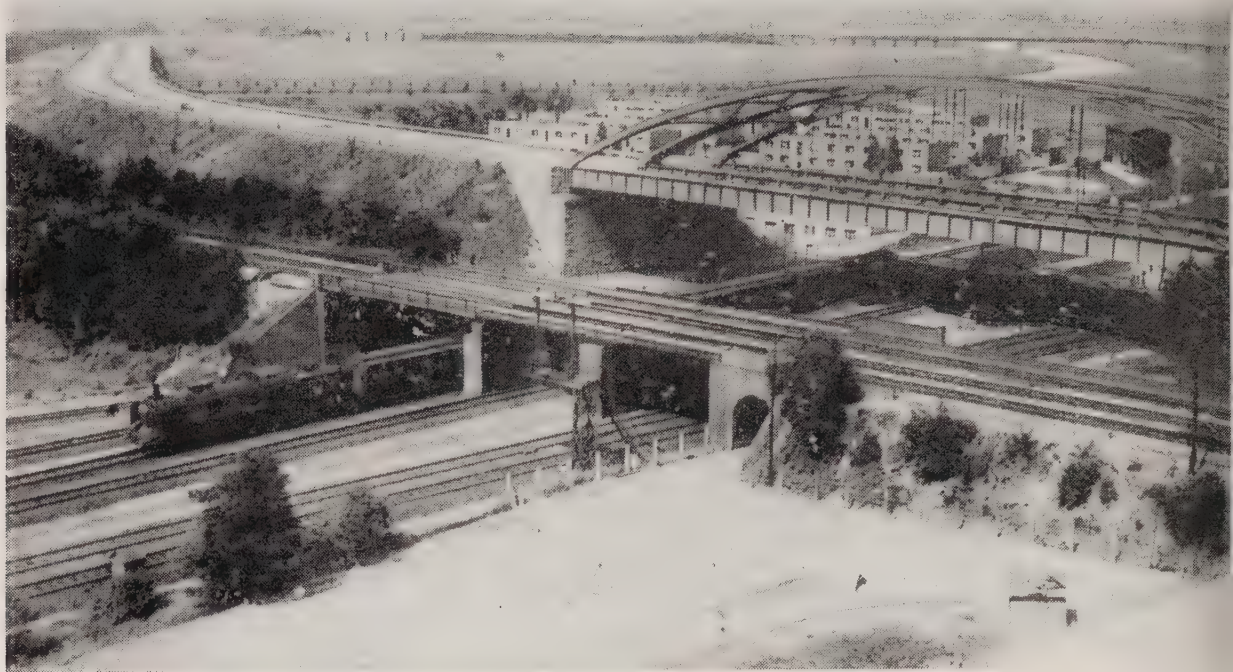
Autobahn bridge at Duisburg-Kaiserberg, looking north
